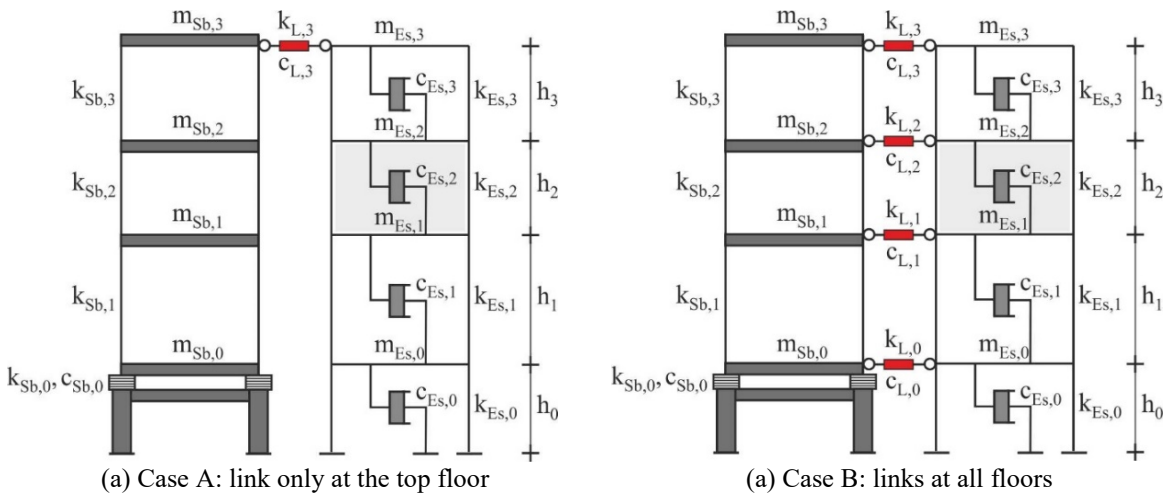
Model of coupling between surrounding building (Sb) and elevator shaft (Es)
